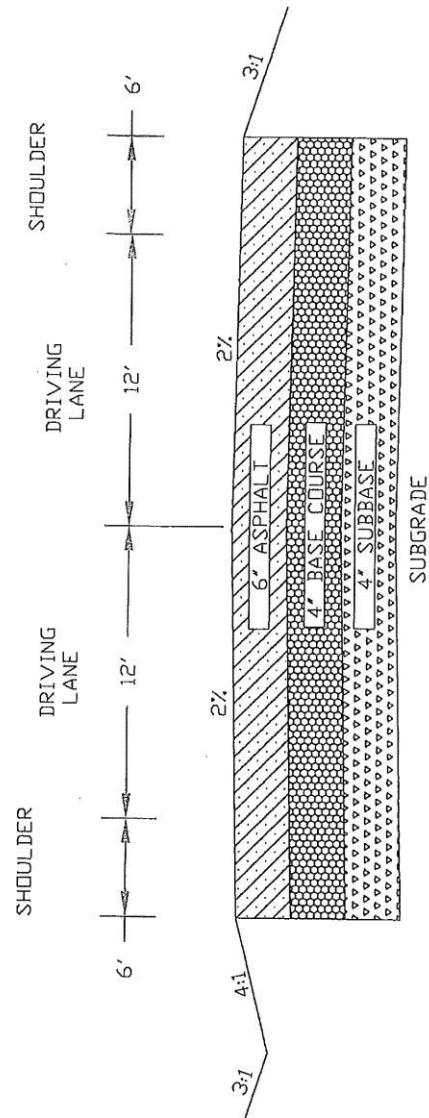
Typical Cross-Section of Two Lane a Arterial Road
